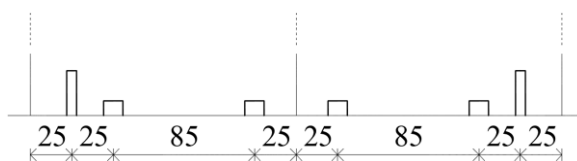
Second attempt arrangement of the connection of the designed segmented wall (measures in cm).
